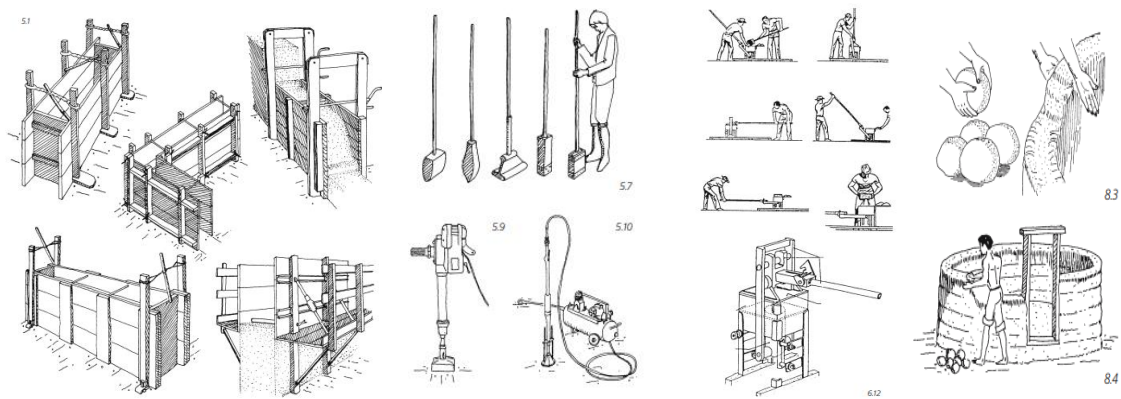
Earthen architecture's construction techniques; rammed earth formwork and tools, production of compressed earth blocks and sculpting earth by hands (Minke, 2006).
